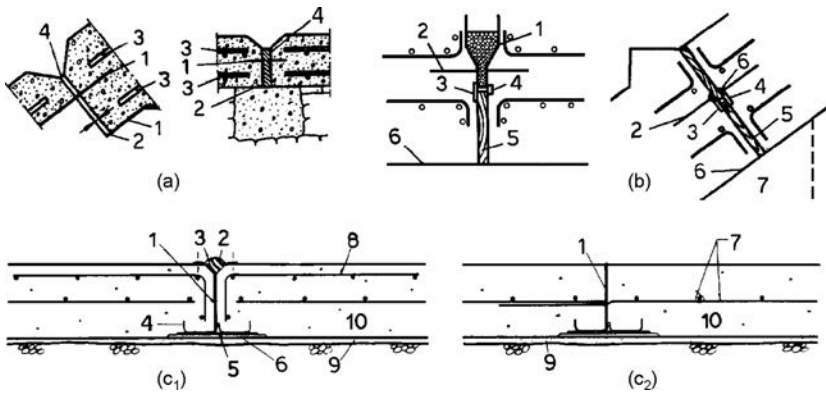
Joints in reinforced concrete facings. (a) Quioch dam: (1) Copper sheet; (2) bitumen; (3) reinforcement; (4) boards, (b) Naradela dam: (1) Cast rubber; (2) metal sheet; (3) bituminous waterproof paper; (4) clamp for fixing of waterproof paper; (5) wood; (6) coating with asphalt mastic; (7) concrete girder; (c) New Spicer Meadow dam: (c<sub>1</sub>) Vertical temperature joint; (c<sub>2</sub>) vertical control structural joint: (1) Bituminous coating on the joint; (2) plastic membrane 3.2 mm, fixed at the ends by means of plates and bolts; (3) sealing compound; (4) copper sheet; (5) bituminous felt of 6.5 mm or PVC strip; (6) mortar bedding; (7) reinforcement in the facing; (8) additional reinforcement in the joint; (9) shot-crete, minimum 2.5 cm; (10) reinforced concrete facing.
